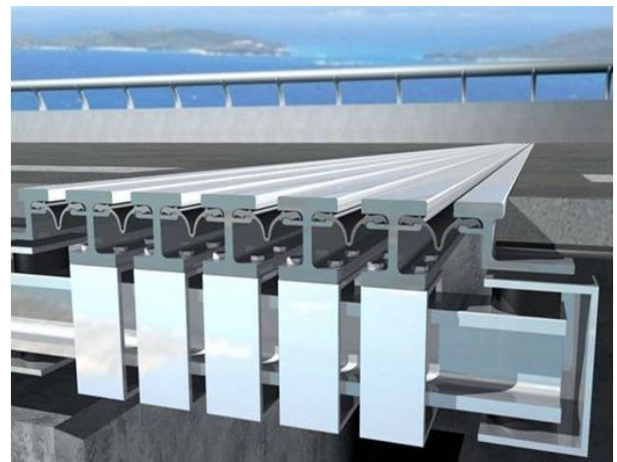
Representation of a modular joint of the type in question showing cross section at a support bar and stirrup connections to centerbeams
